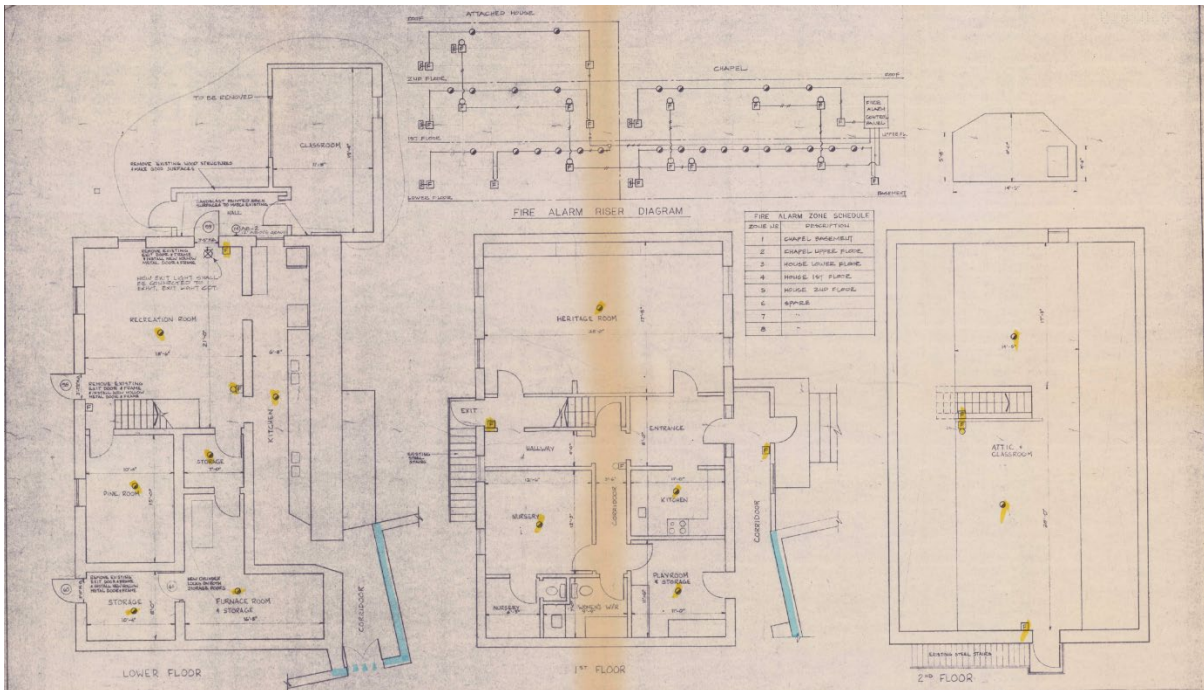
Fire alarm plan for the Wheler House showing first, second and attic floors. 1983. Toronto Building Records.
